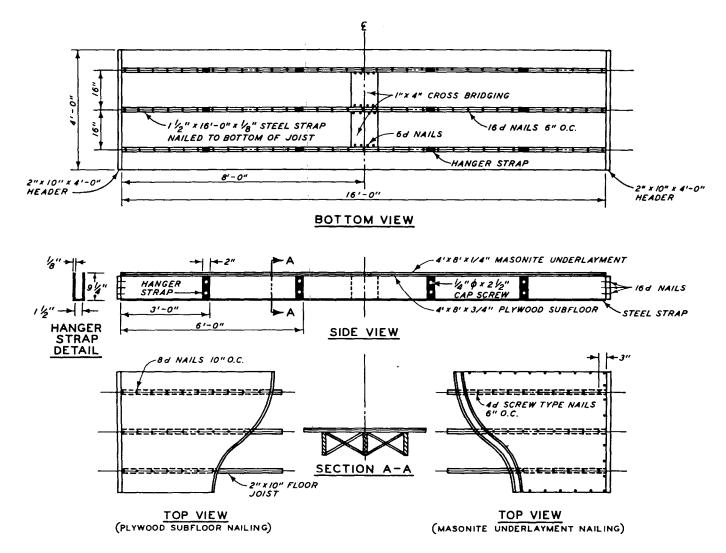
Construction drawing for the hanger strap-steel strap reinforced test specimens (X and XI).
